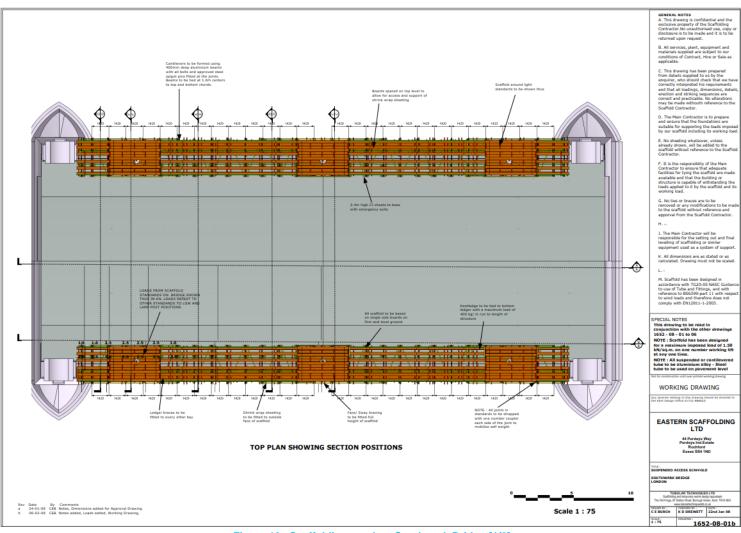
Scaffolding used on Southwark Bridge [1/6]
